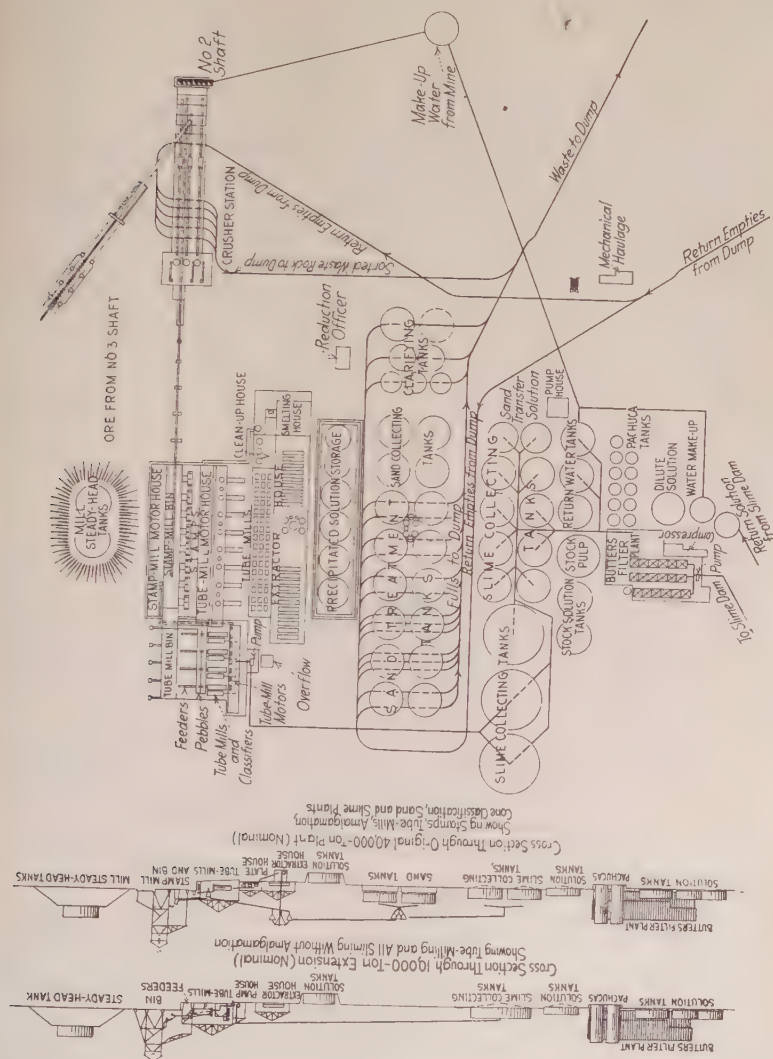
ARRANGEMENT OF OLD AND NEW SECTIONS OF SPRING MINES PLANT.
